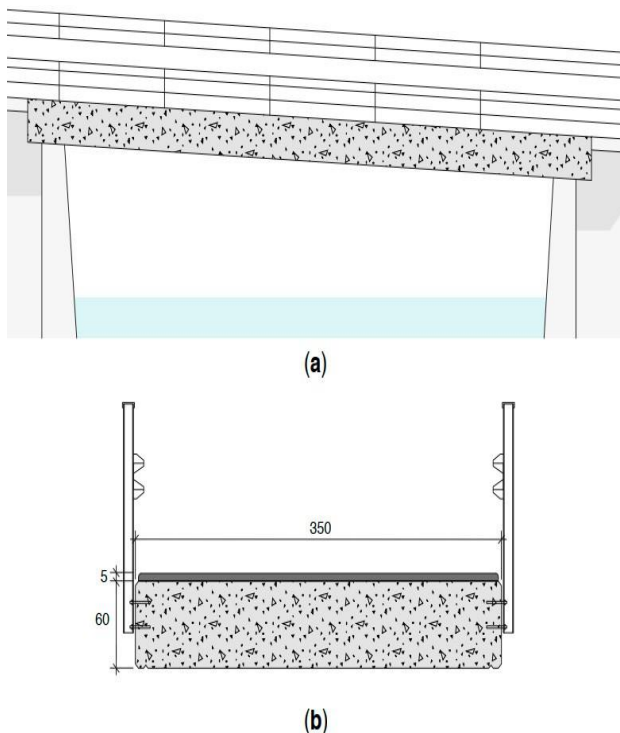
Design of the concrete bridge: (a) elevation, (b) cross-section.
